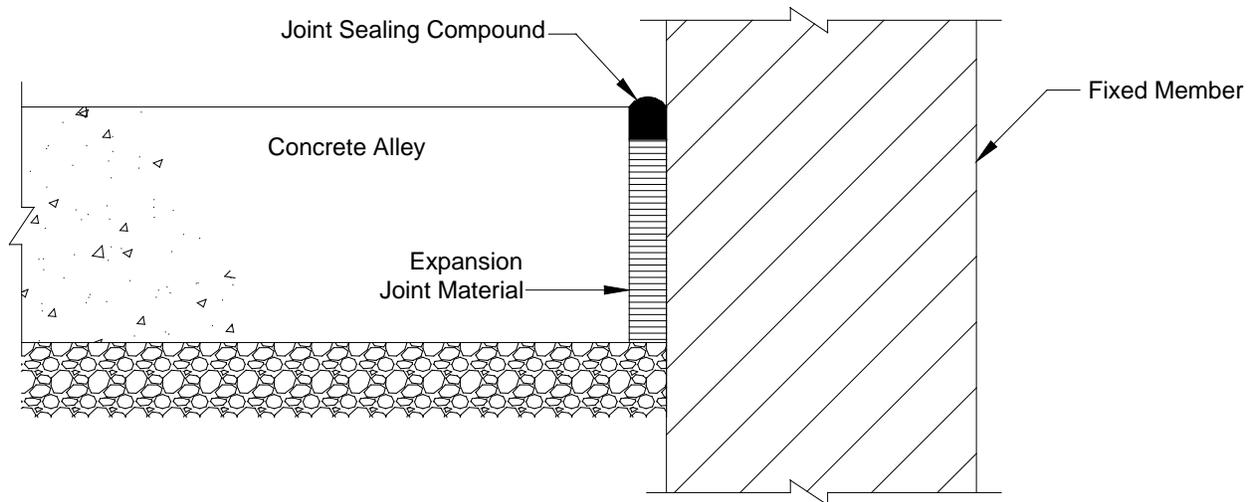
Expansion joint located between a barn alley and a fixed part of the barn such as a structural column.
